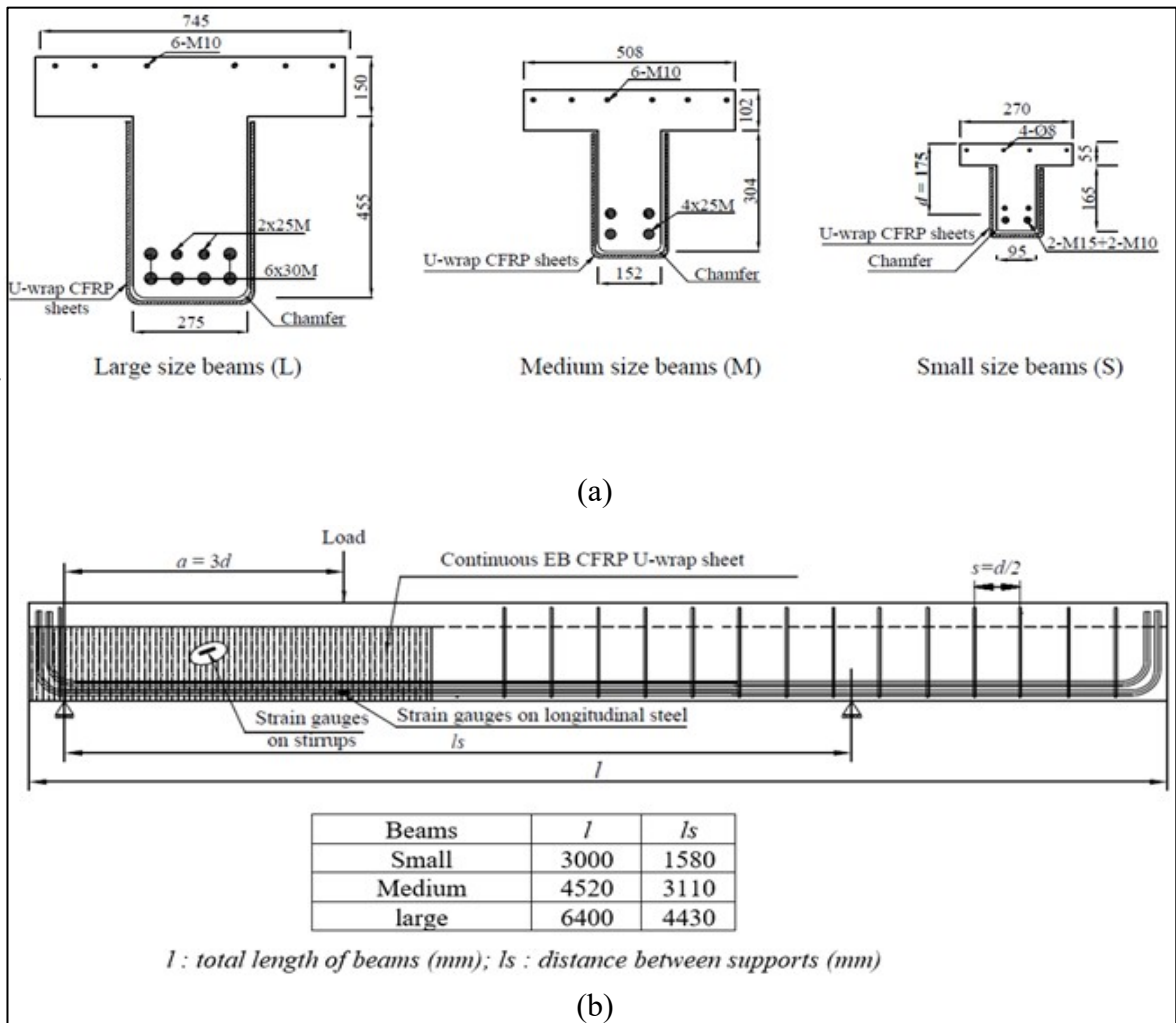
Details of beams: (a) cross-sections of large, medium, and small specimens (mm) and (b) elevation of beam and position of three-point loading conducted by Benzeguir et al. (2019)
